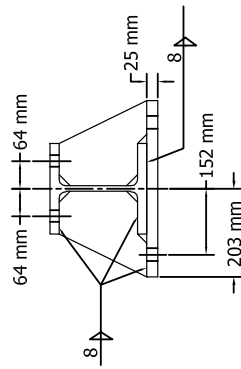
Truss-bridge details G, H, and I (metric sizes)
